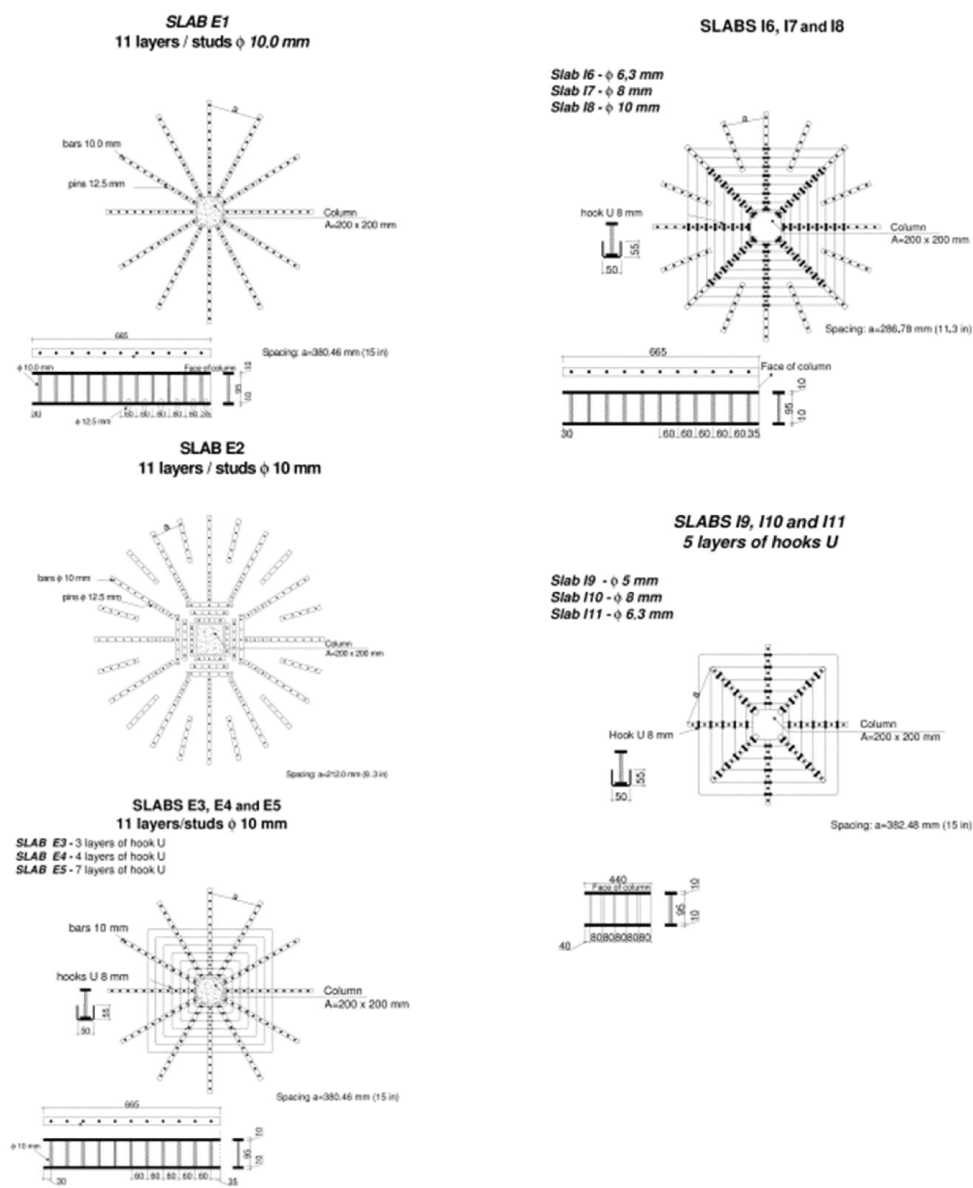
Shear reinforcement details for specimens of Trautwein et al (2011)
